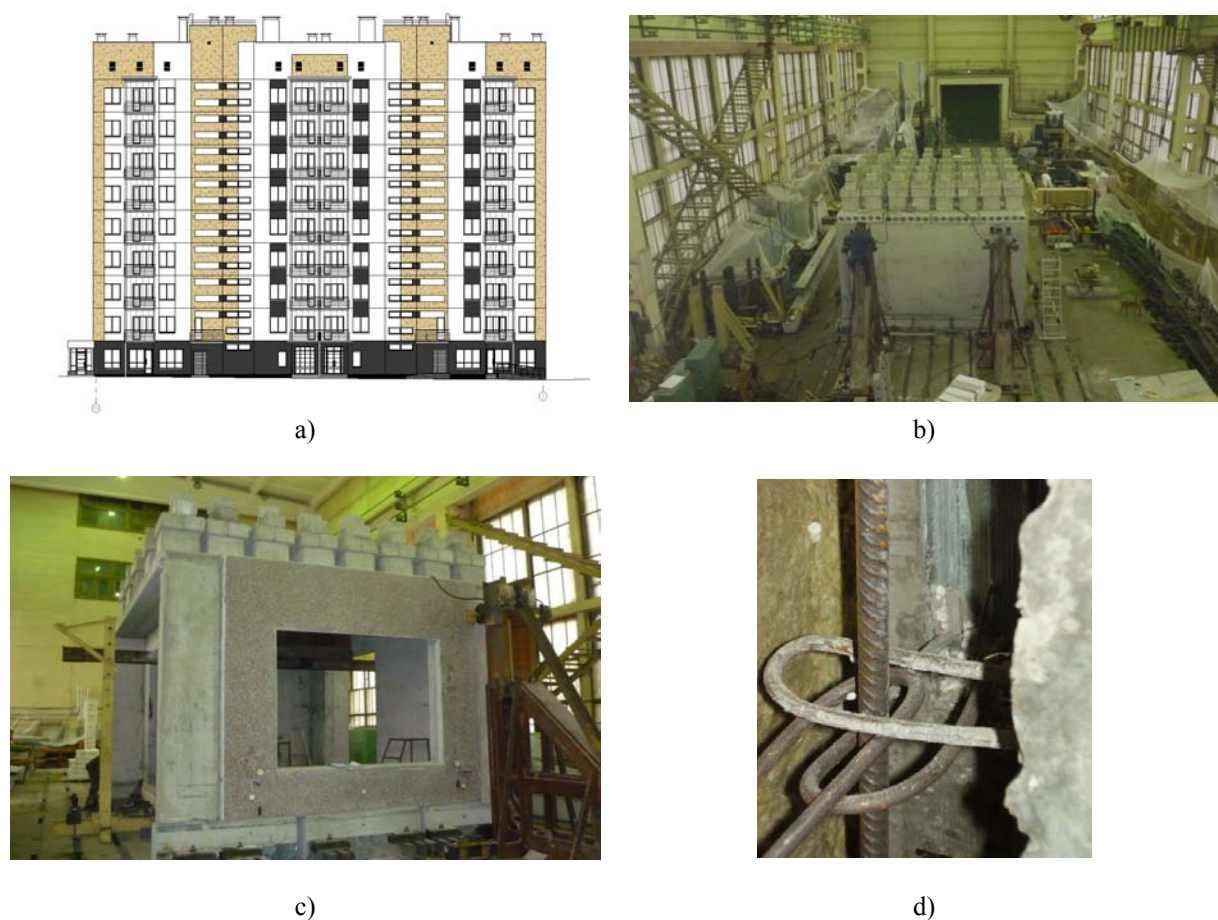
Facade and section of the 9-storied large-panel building in Simferopol:
